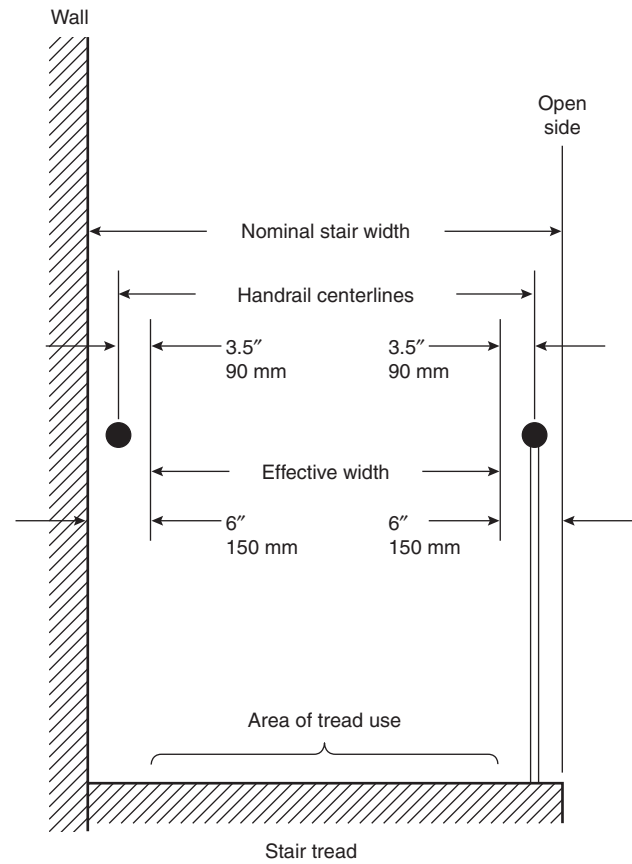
Measurement of effective stair width in relation to walls and handrails.
